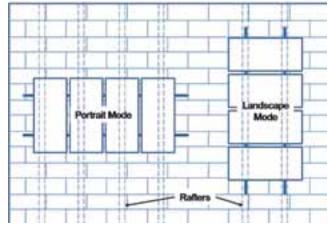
Portrait and Landscape Illustration Arrays can also be installed in landscape mode, with the modules oriented so that their long edge runs horizontally across the roof and the rails run up the roof slope.
